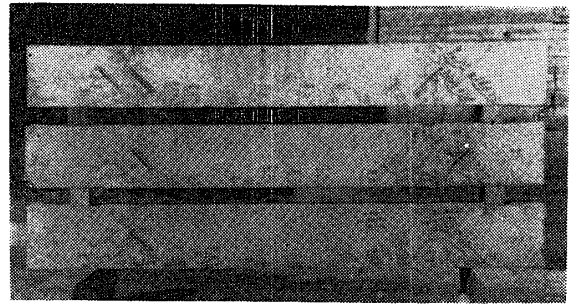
,b Right side crack of the steel bar over reinforced concrete beams
